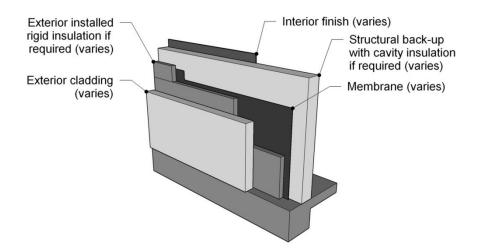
Typical Assembly Layers for Exterior Infill Wall Enclosures
